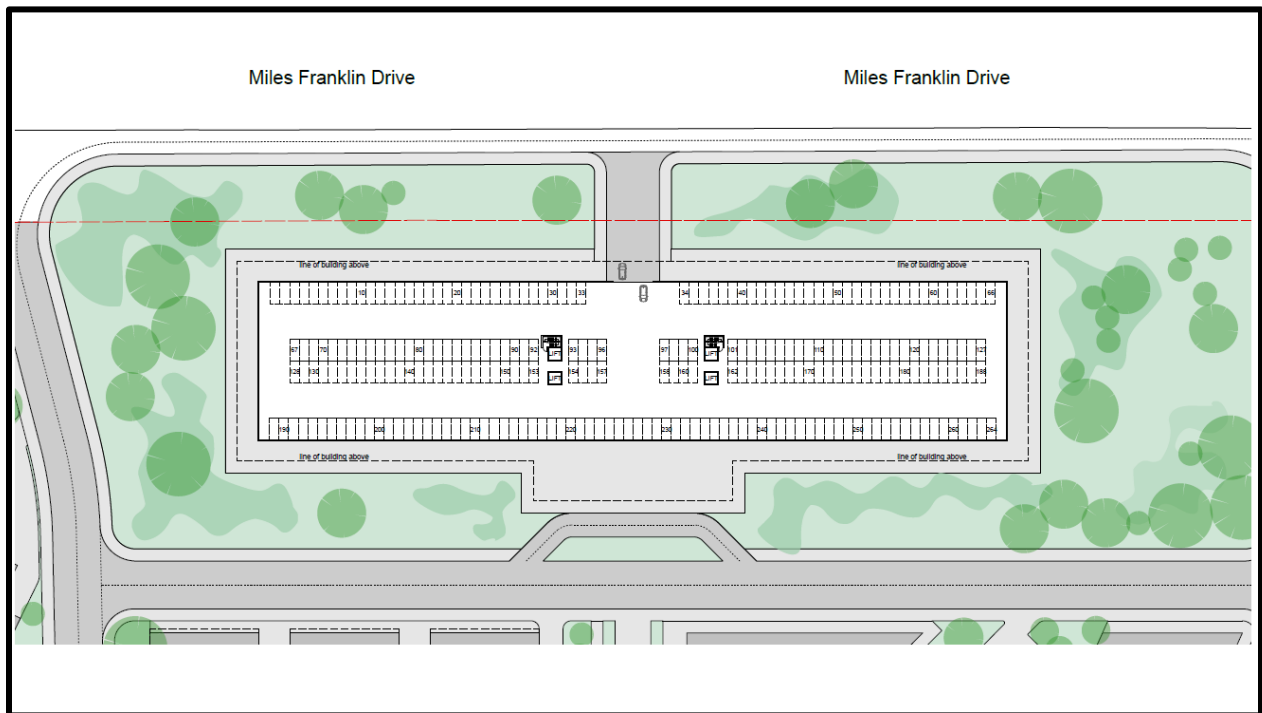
Spa Hotel Basement Plan (Source: Robert Harwood Architects)
